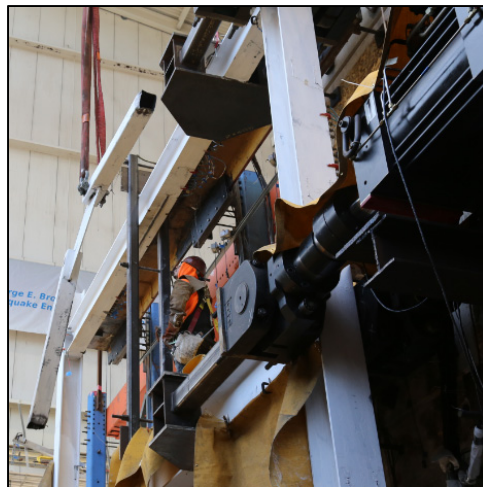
Demolition of NCBF-B-1 damaged second-story braces and gusset plates.
